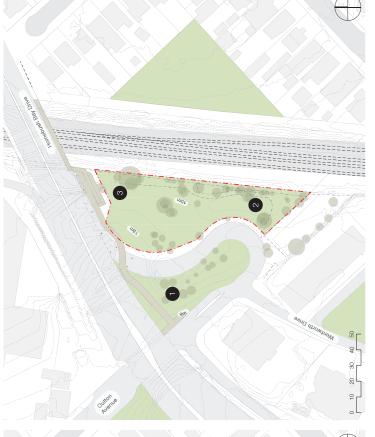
Lewis Berger Park (No. 10 Open Space Network Greater Context Plan) Immediate Context
